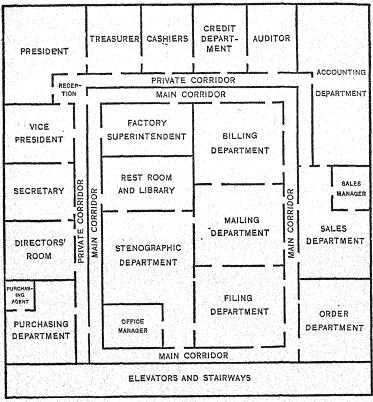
FLOOR-PLAN OF OFFICE IN NEW YORK CLOTHING ESTABLISHMENT,
